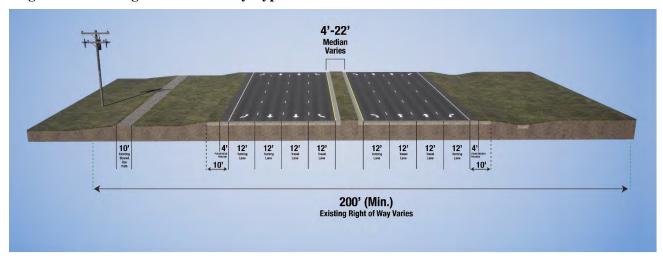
Existing S.R. 70 Roadway Typical Section from west of S.R. 31 to west of Townsend Road.
